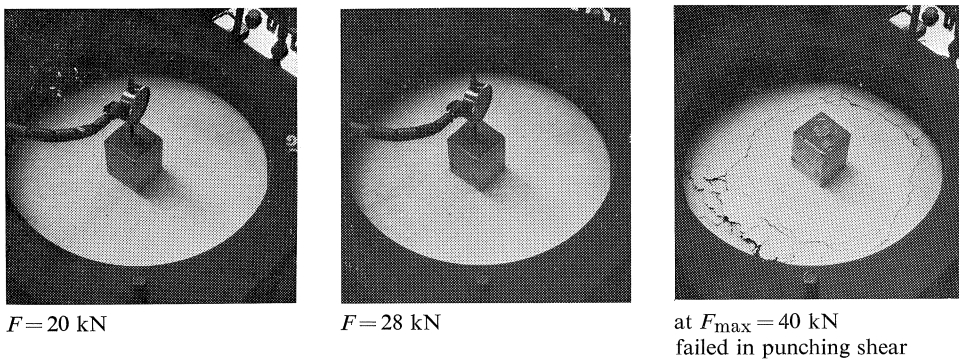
Crack patterns and failure pattern of specimen II-9 (with inclined punching shear reinforcement).
